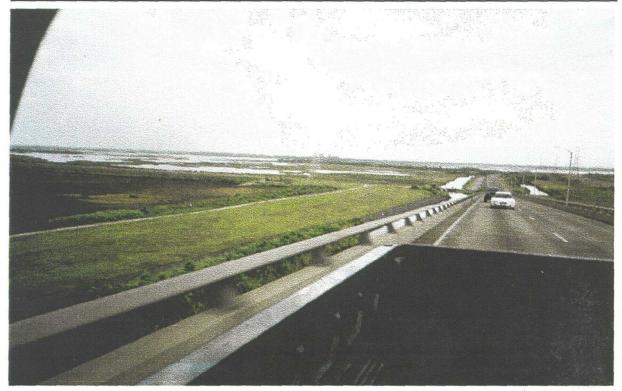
of 23 Date: 7/10/00 Time: 12:00 Taken by: Mark Taylor View from the Rainbow Bridge looking north.
